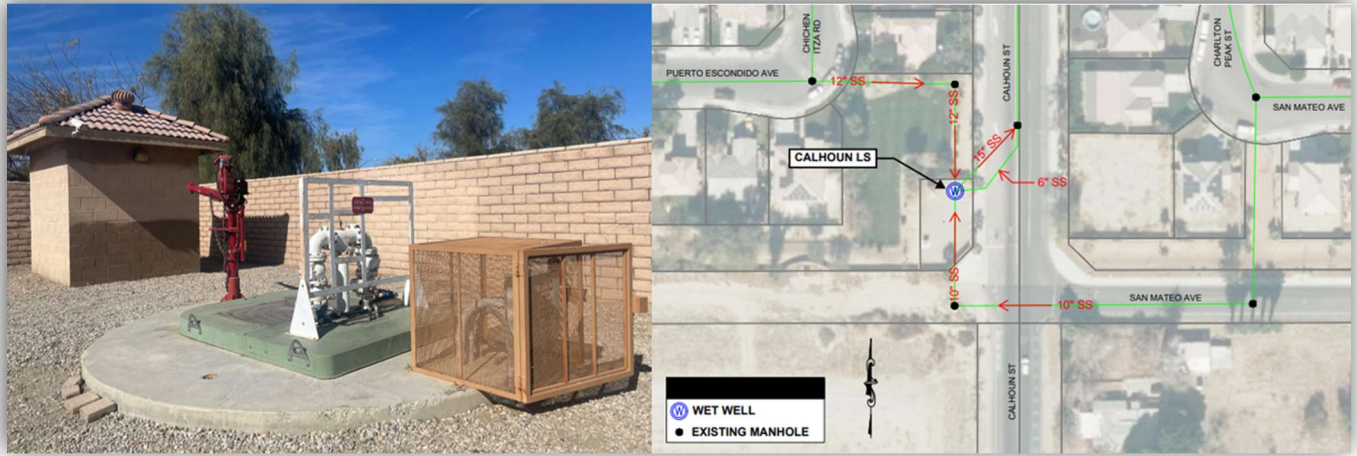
Calhoun Lift Station Schematic and Site Photo
